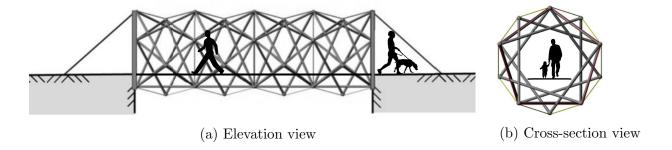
Elevation view (a) and cross-section view (b) of a "hollow-rope" tensegrity foot-bridge
